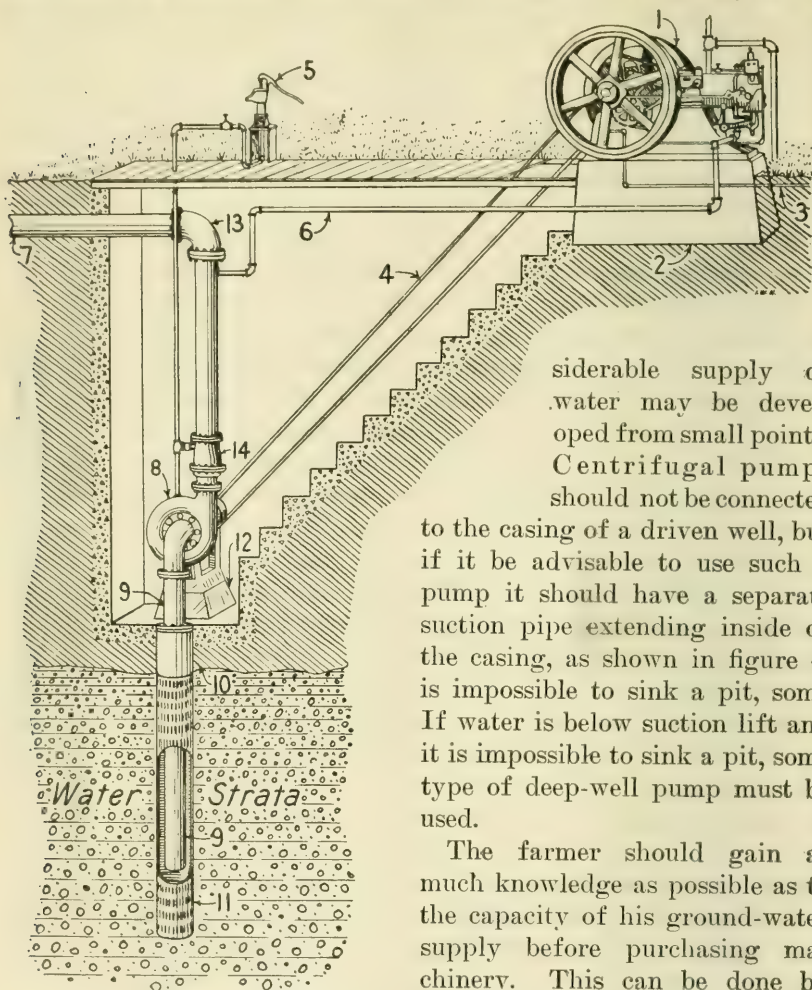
Typical installation of horizontal pump in brick or concrete pit with sloped belt. 1, Engine; 2, engine foundation; 3, fuel pipe; 4, belt; 5, priming hand pump; 6, water-cooling pipe for engine; 7 discharge pipe; 8, pump; 9, suction pipe; 10, well casing; 11, well screen; 12, pump foundation; 13, long-turn elbow; 14, check valve.
